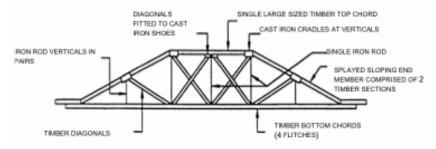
Schematic diagram of a McDonald Truss (derived from DMR 1987)
